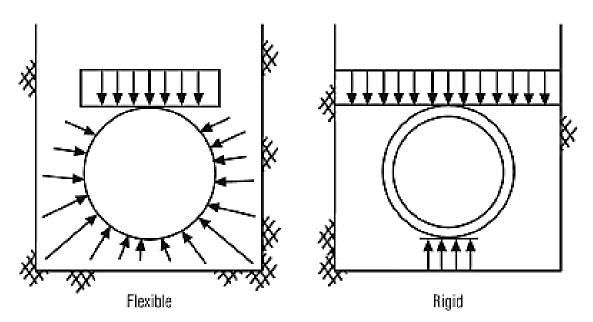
Flexible and Rigid Pipe Backfill Interaction (PPI 2008)
